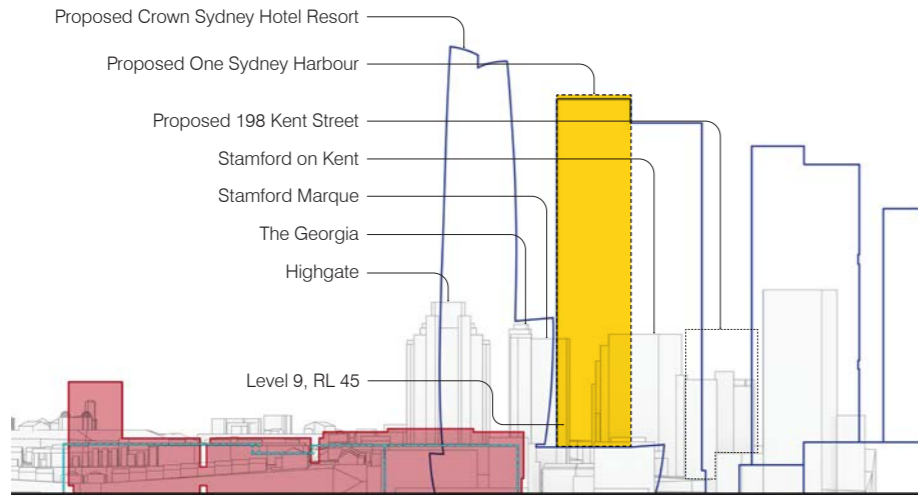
Elevation Looking East - MOD 9 with the Approved Concept Plan shown in light blue outline (Source: Modified from HASSELL diagrams (November 2018))
